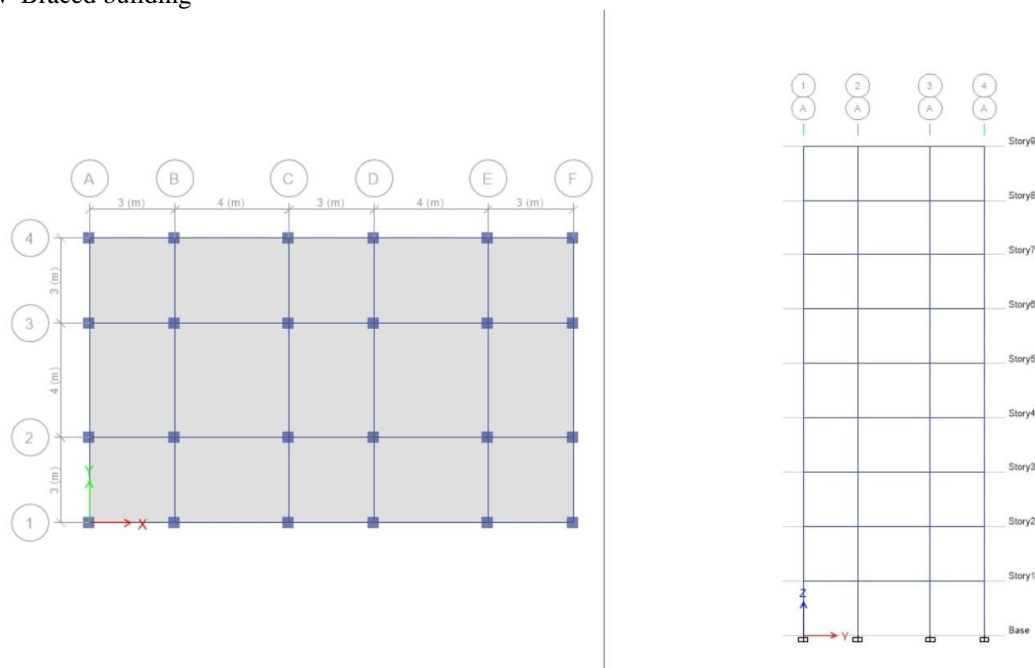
PLAN AND ELEVATION OF UNBRACED G+8 BUILDING
